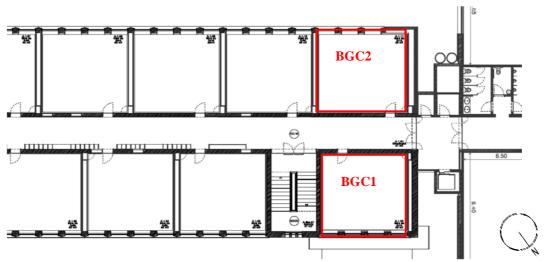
Escola Secundária Abade de Baçal – Classrooms' BGC1 and BGC2 location in the school – Level 1 plan (building A). [Source: Parque Escolar, EPE (2012)]
